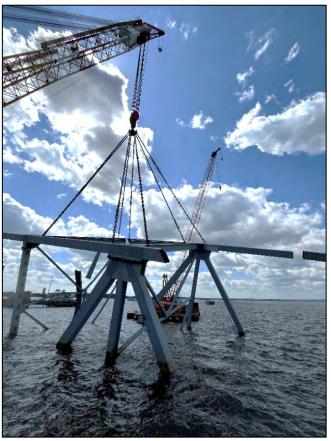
May 31: CHESAPEAKE 1000 lifting section 4-B breaking mud suction and determining what connections remained that required severing.
